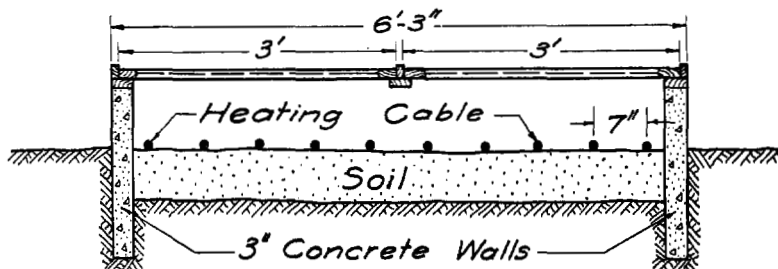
Sectional view showing cable on surface of soil. The cable should be parallel with the rows of seedlings.
